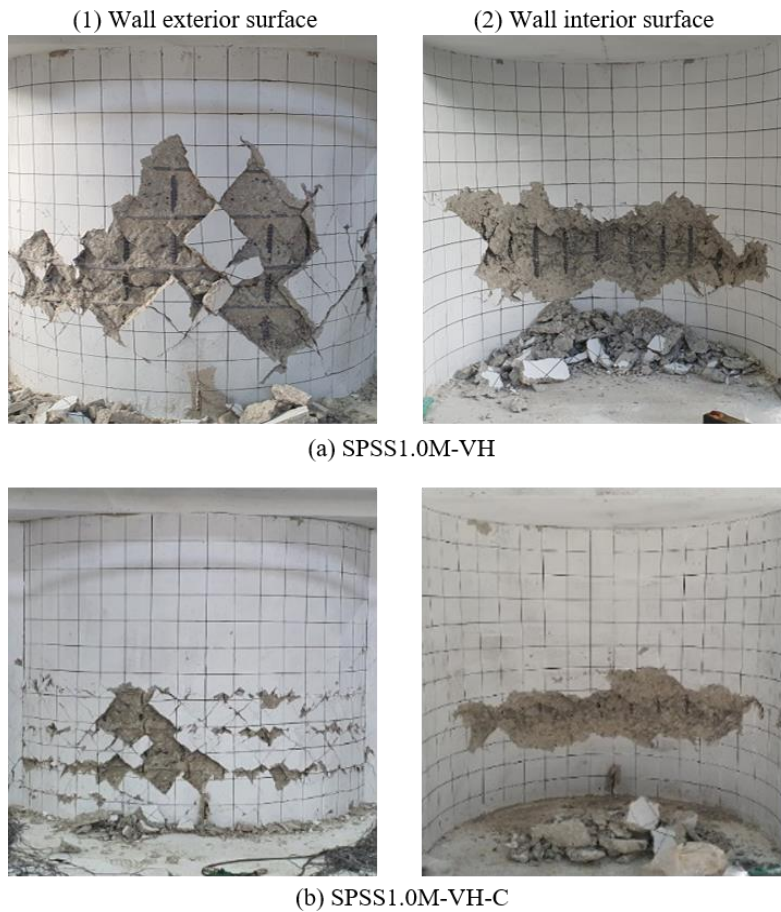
Damages on semi-cylindrical specimens at the end of test -2
